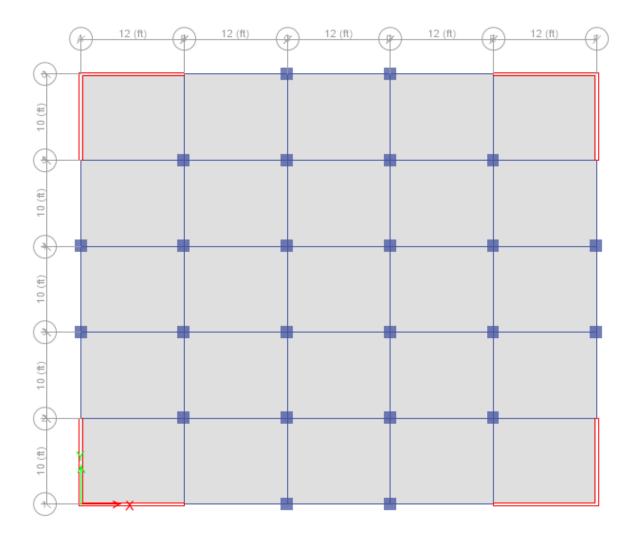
Plan View of the Model with Shear Wall at Four Corners
